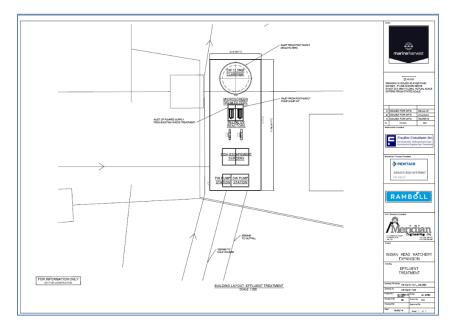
Effluent Treatment Building 2 Equipment and Layout
